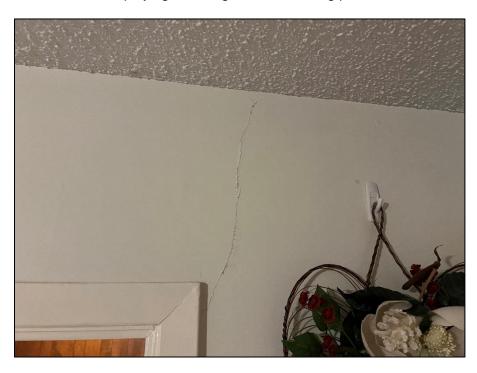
Typical view of ceiling displaying drywall cracking.
